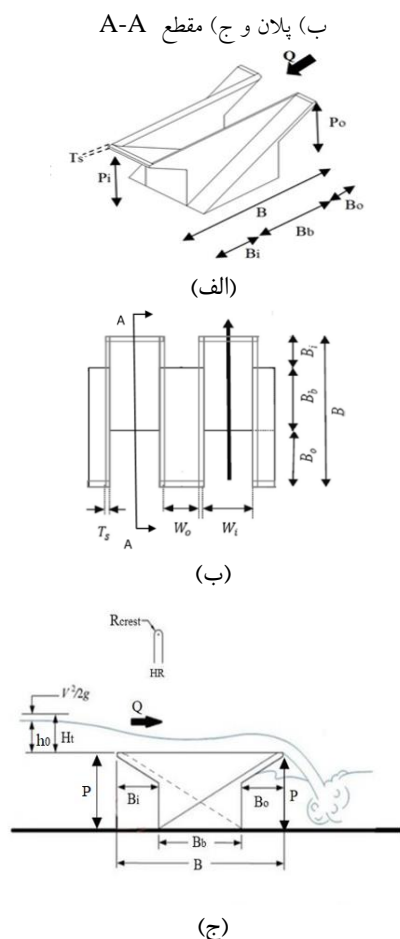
Piano key weir parameters: a) 3D view, b) Plan and c) Section A-A
